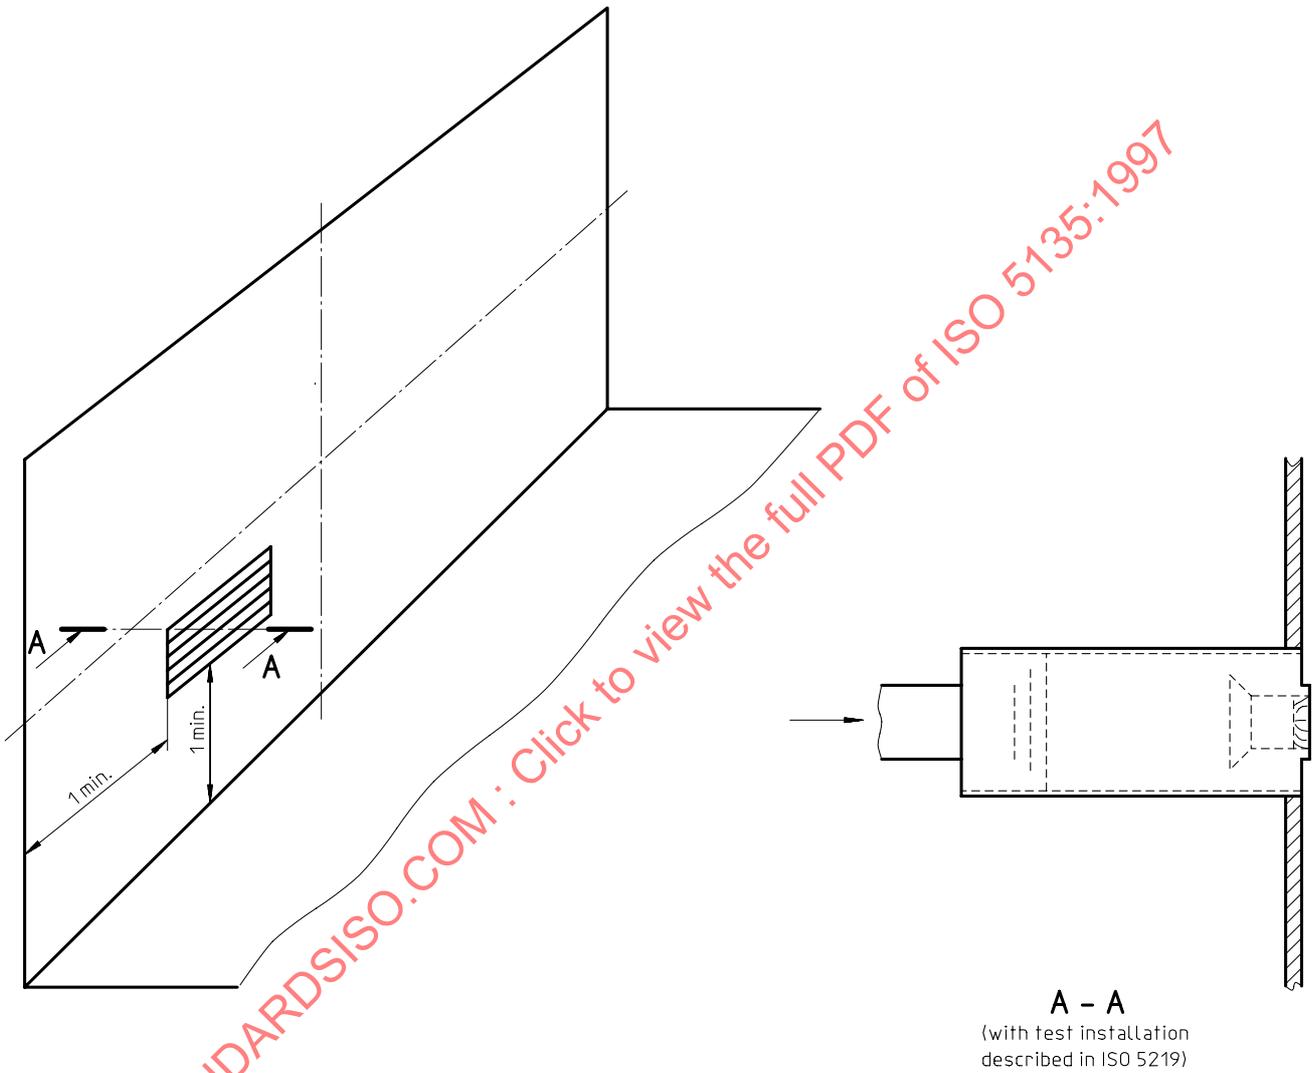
Mounting detail for air-terminal device installed on or against a surface
